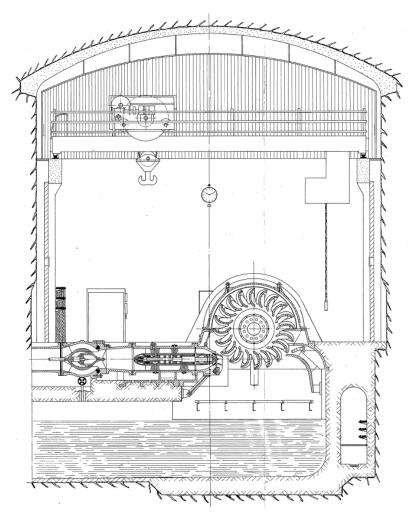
Cross-section through underground powerhouse with Unit 2 of the Gondo power plant equipped with Pelton turbine of 18.5 MW
